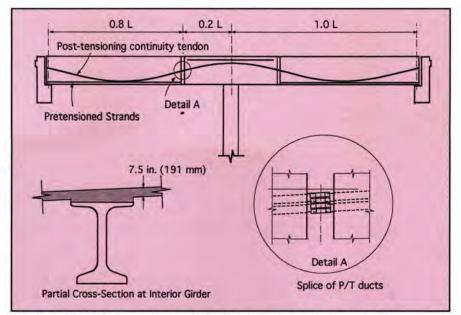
Span configuration and post-tensioning layout of system used in shape optimization.
